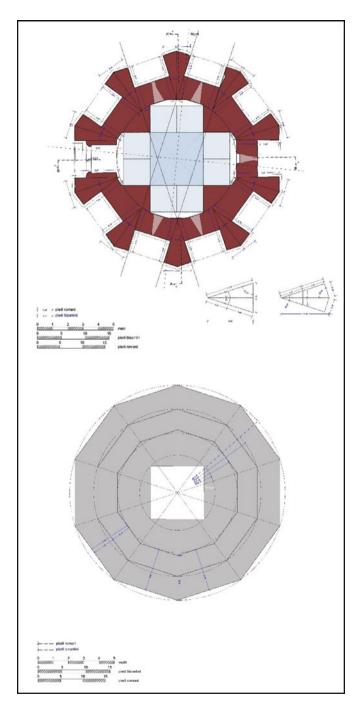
Plan of the first floor: geometry and measurements in Byzantine feet
